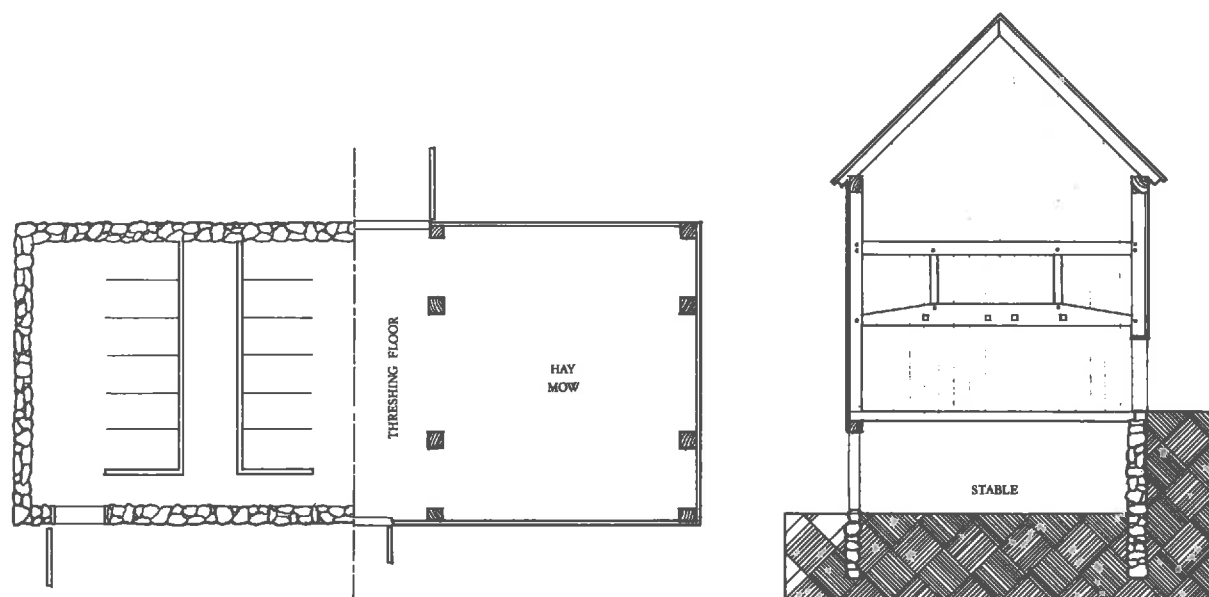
Stable and loft plans (superimposed) and section of a bank barn.
